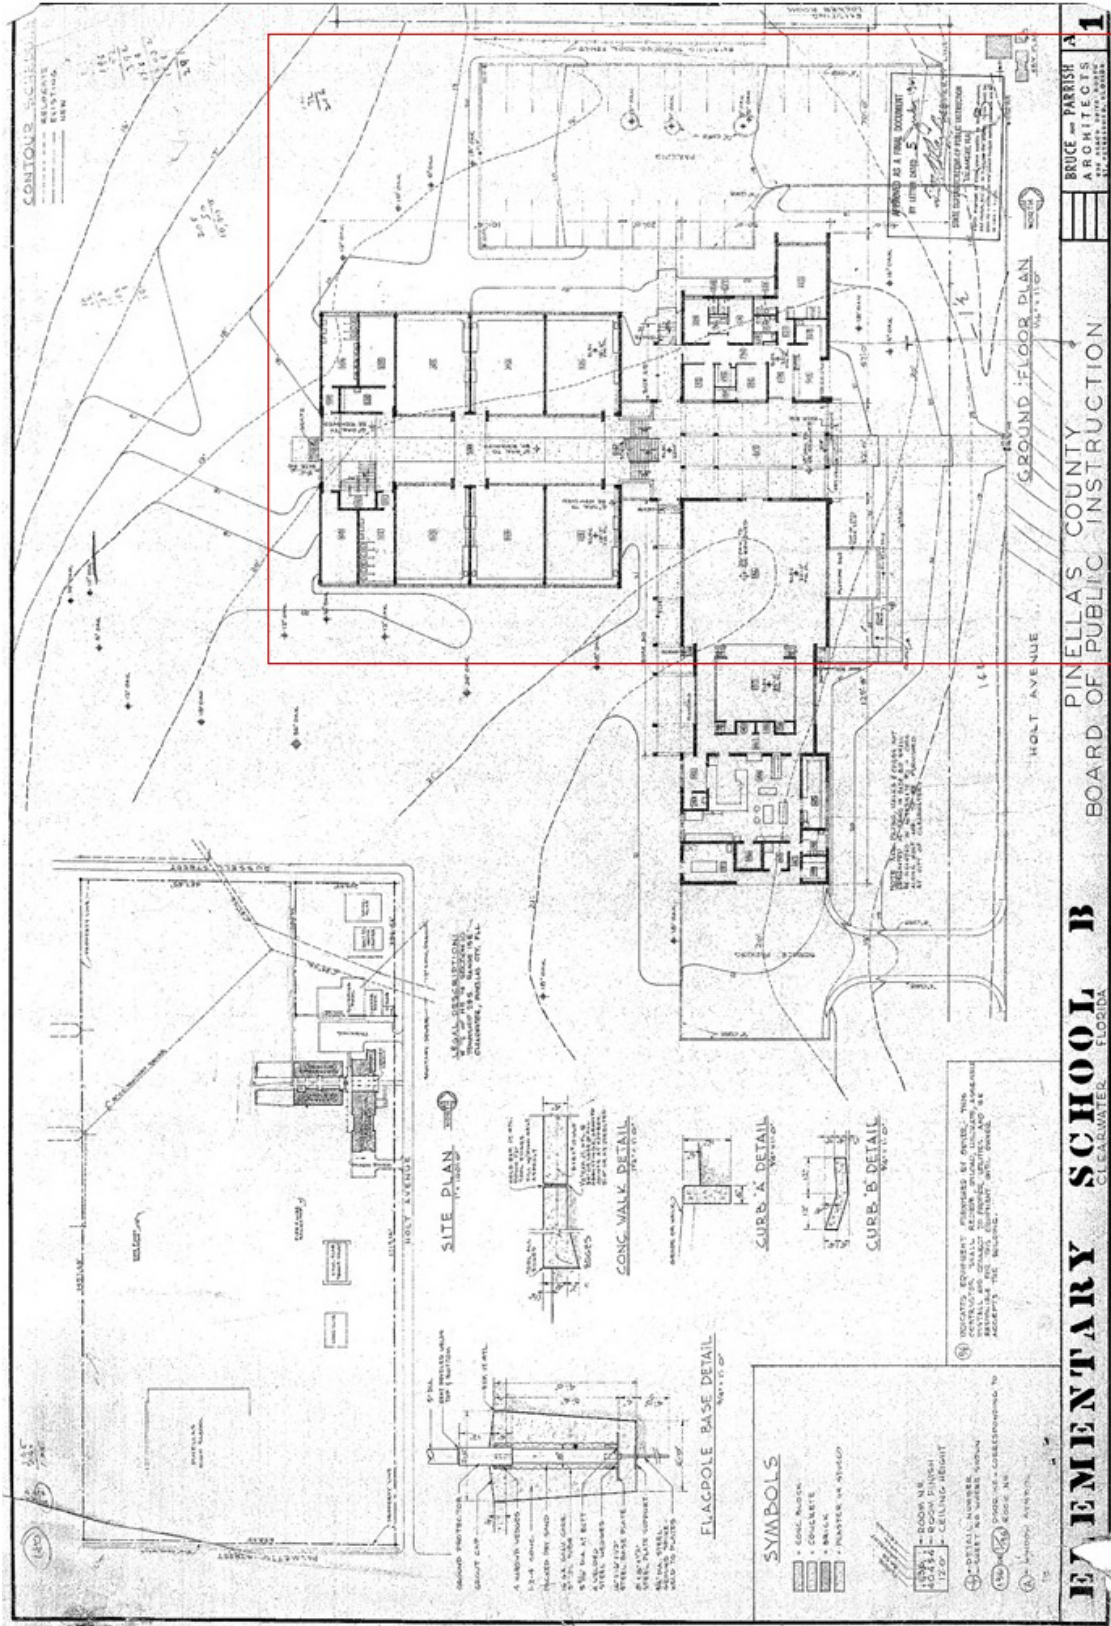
1961 architectural plans of school building page A1, showing contour lines and cemetery boundary denoted in red
